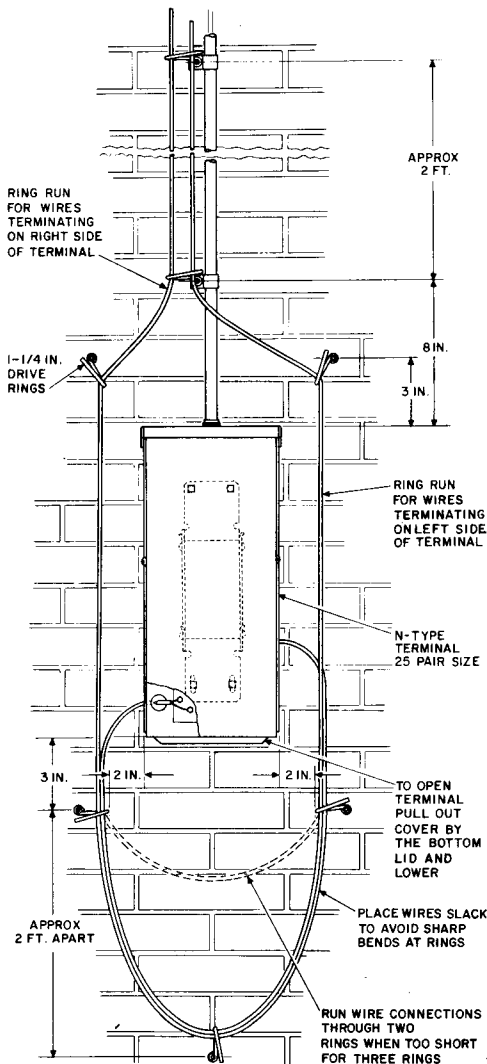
Wall Mounted 25-Pair Cable Terminal With Stub at Top
